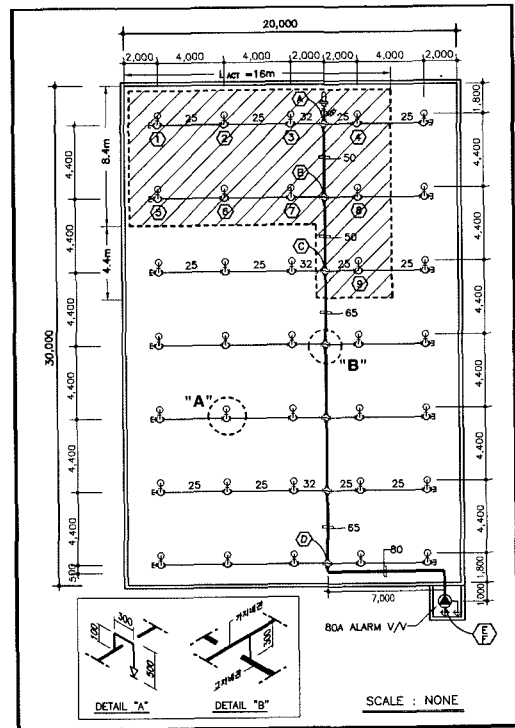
Plan View of Pipe Schedule Sprinkler System(Case "3", NFPA 13).
